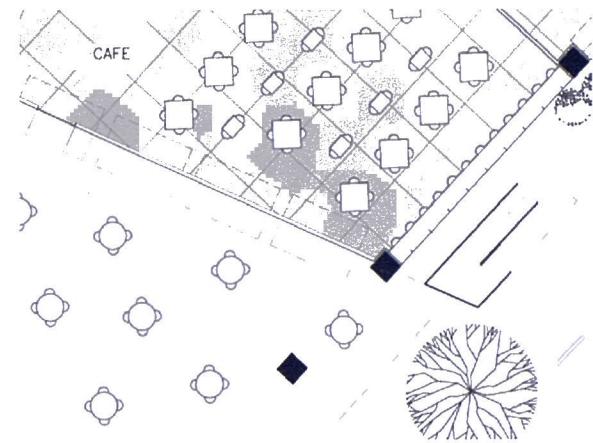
Partial ground floor plan highlighting outdoor dining and cafe
